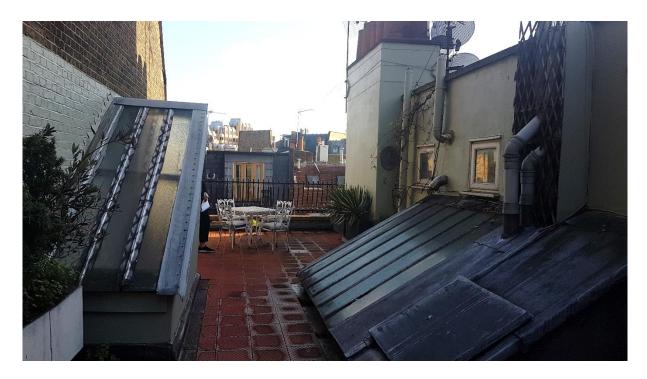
Roof level view towards the front elevation and Monmouth Street – original roof stucture no longer exists.
